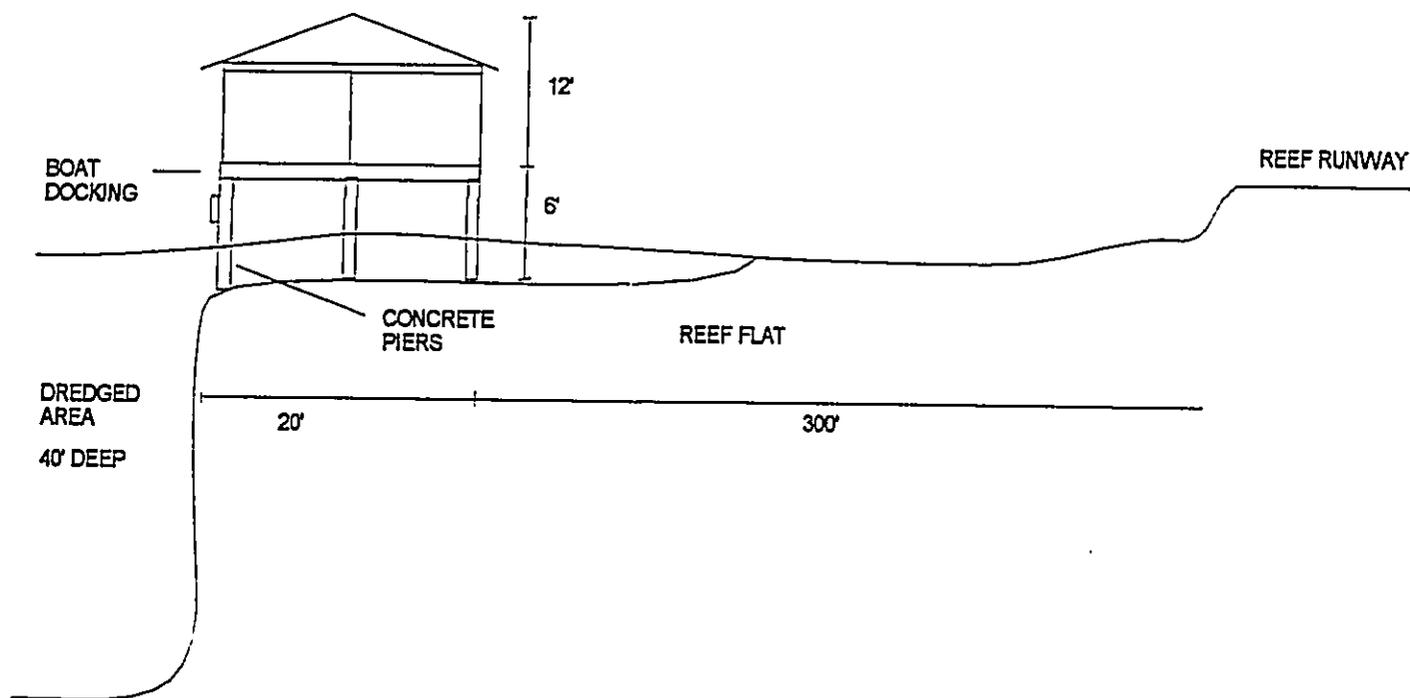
WORKING PLATFORM. SIDE VIEW LOOKING WEST.
